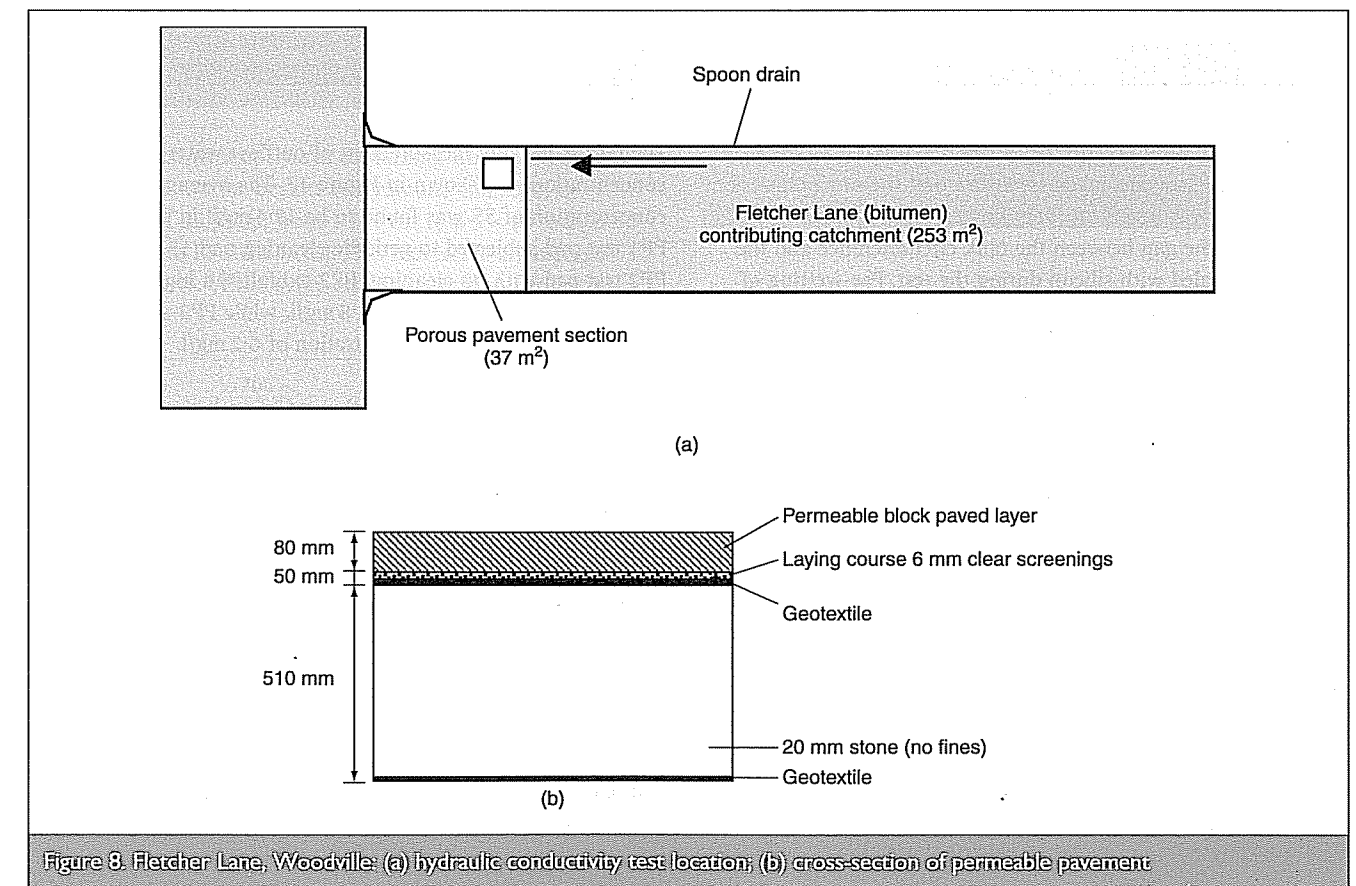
Fletcher Lane, Woodville: (a) hydraulic conductivity test location; (b) cross-section of permeable pavement
